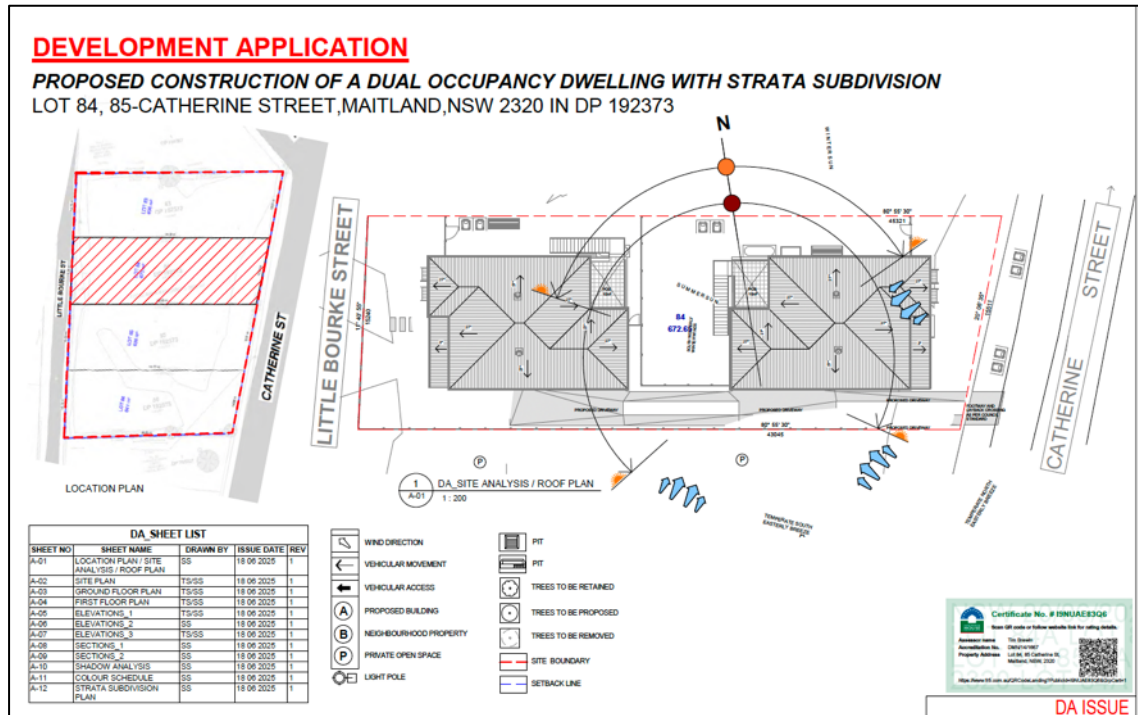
Lot 84 – Location Plan and DA Site Analysis/ Roof Plan
